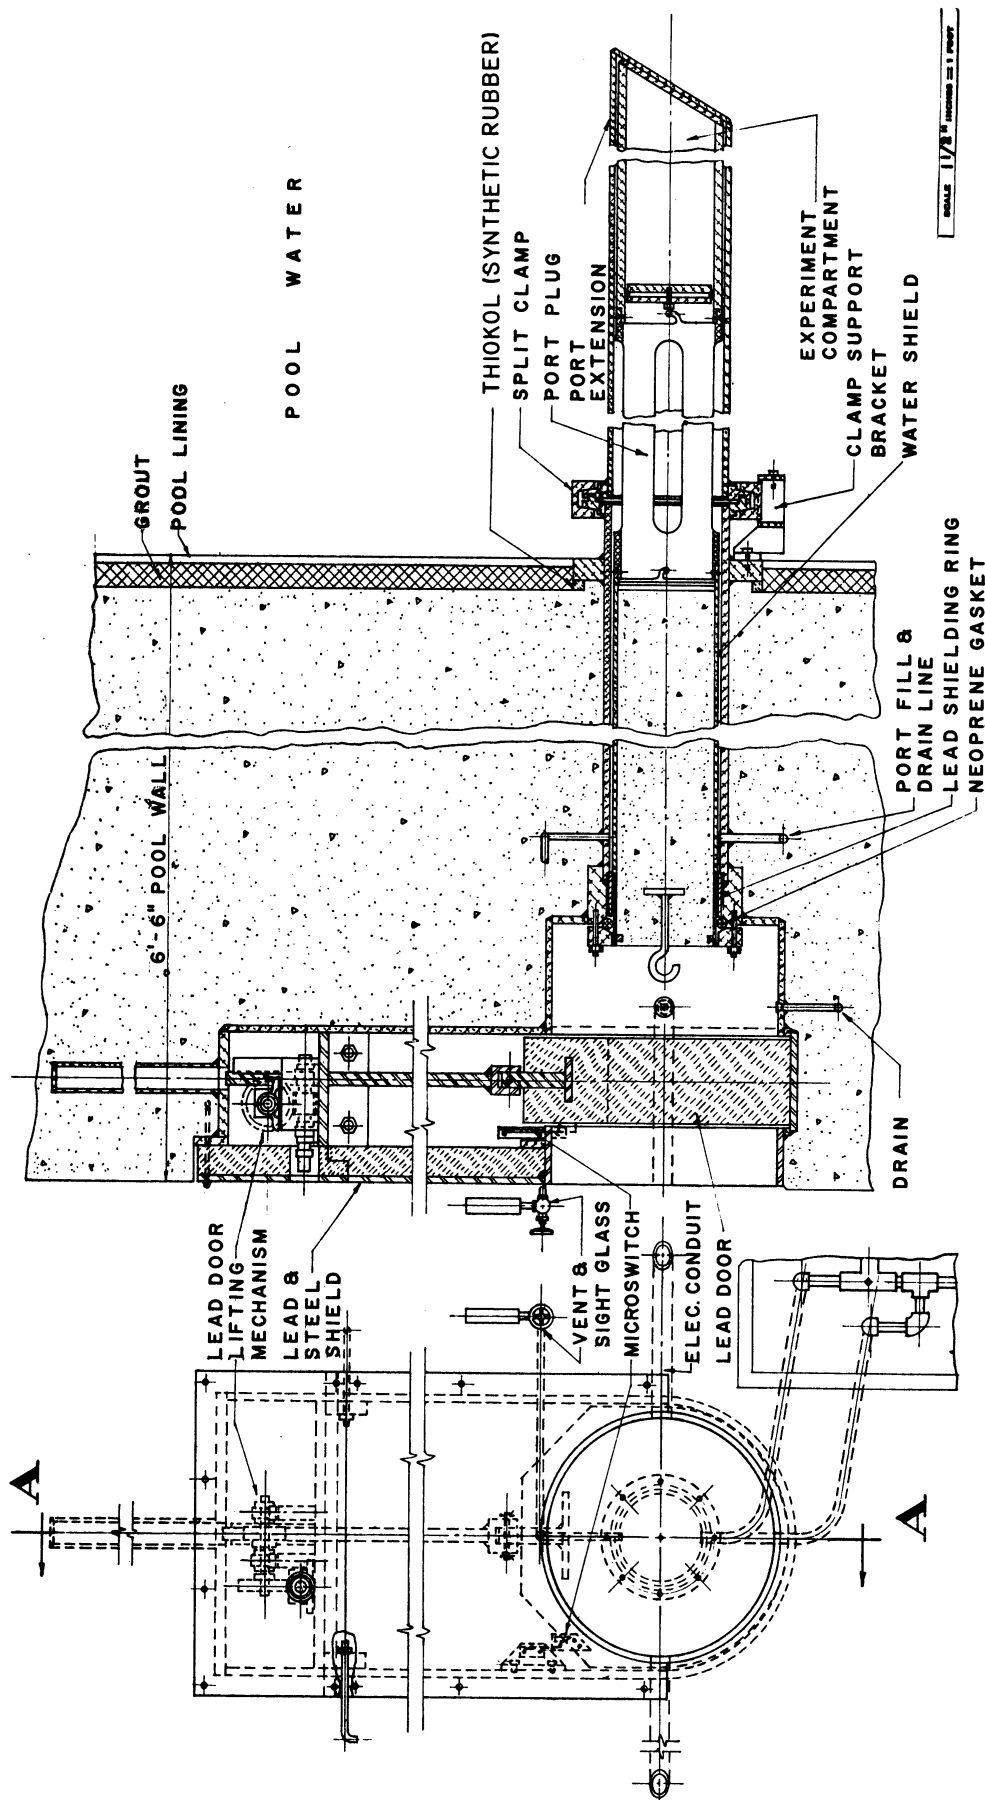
Section and Elevation View of a Typical Experimental Port with Plug and Door
